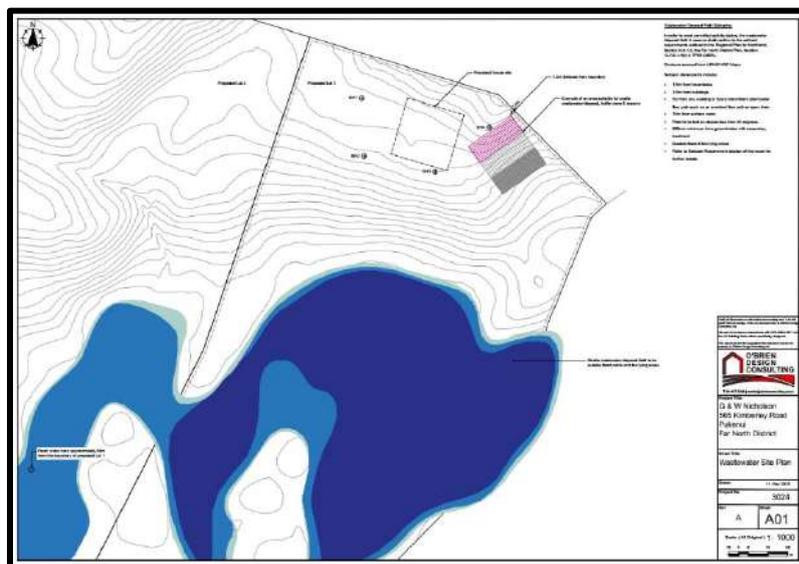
O'Brien Design Consulting Wastewater Site Plan.
